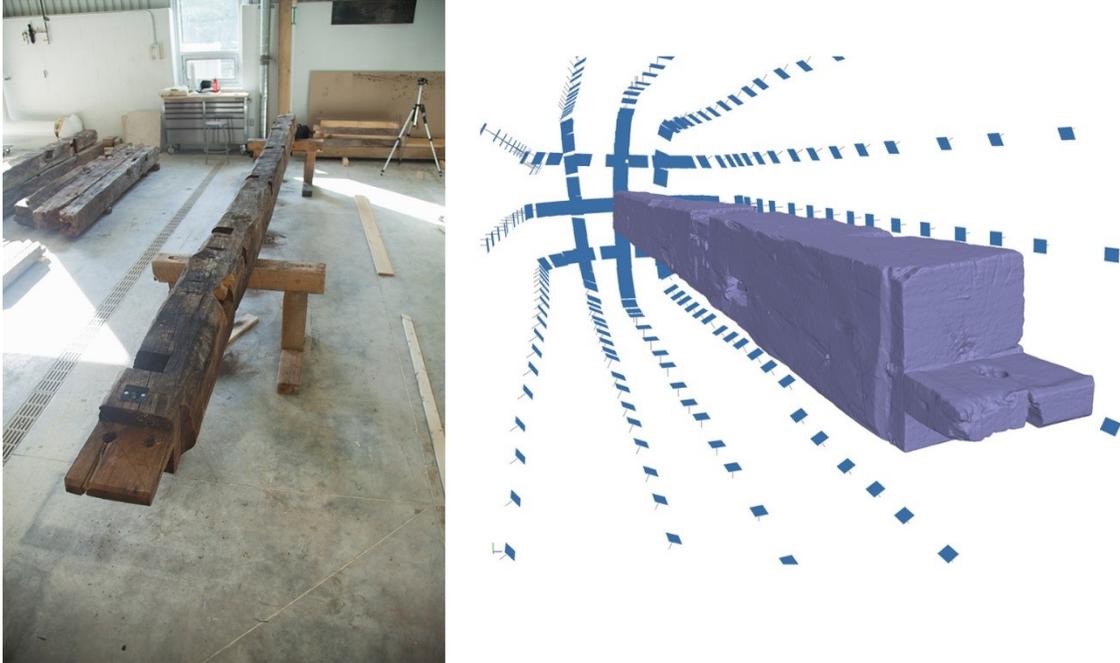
Timber trestle (right) and typical photogrammetric network for timbers (right)
